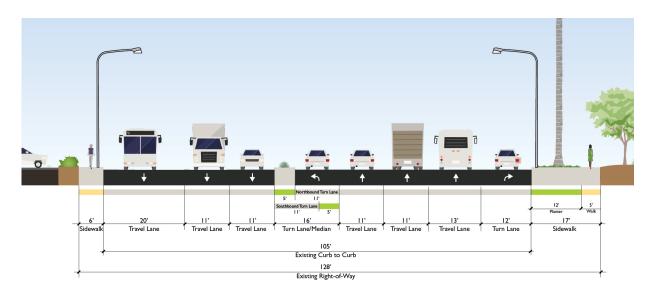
Existing Conditions Cross-section: Dakota Avenue to Dayton Avenue (facing North)
